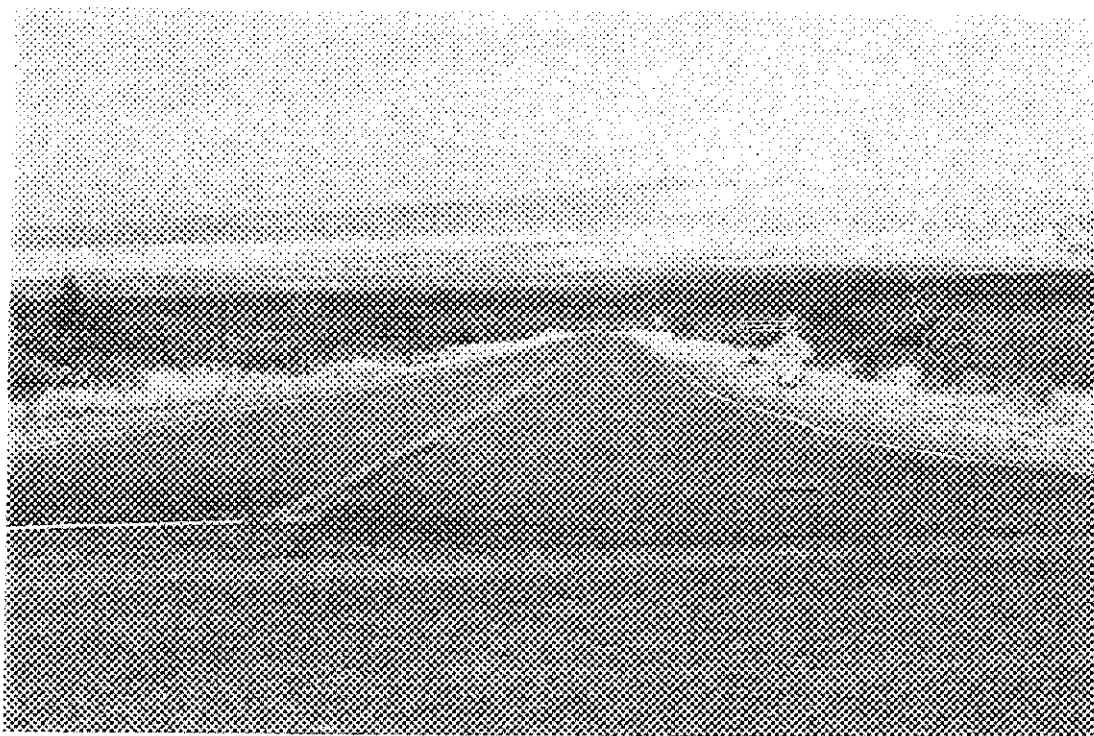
MP 0.00 - Begin route at Panther Junction, typical pavement section
